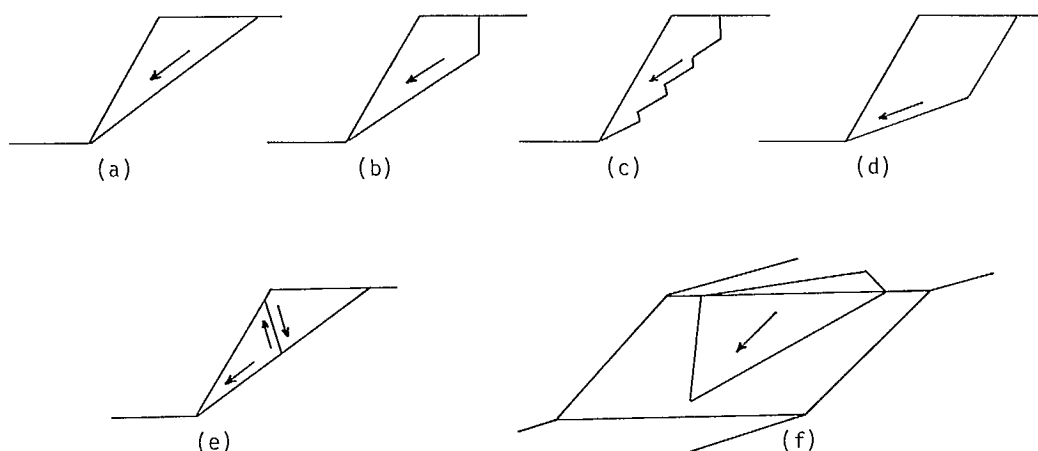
Plane shear instability modes: (a) one sliding plane and one block; (b) one sliding plane and a tension crack; (c) a series of short sliding planes with connecting cross joints; (d) two sliding planes; (e) a single sliding plane with the sliding block shearing into several blocks; and (f) two oblique sliding planes and a 3-D wedge.
